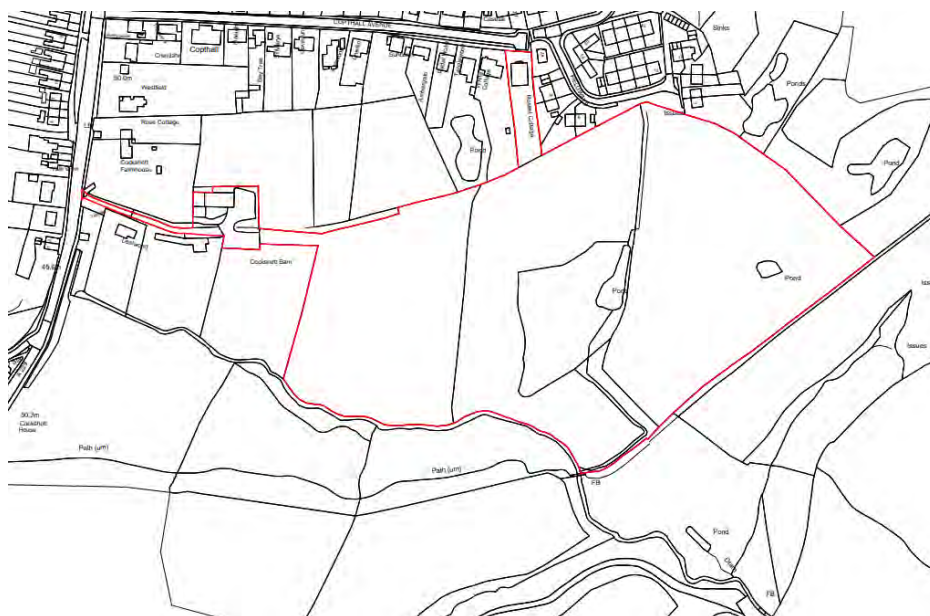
Site Location Plan Extract For Planning Application LPA ref. 18/01063/FULL
